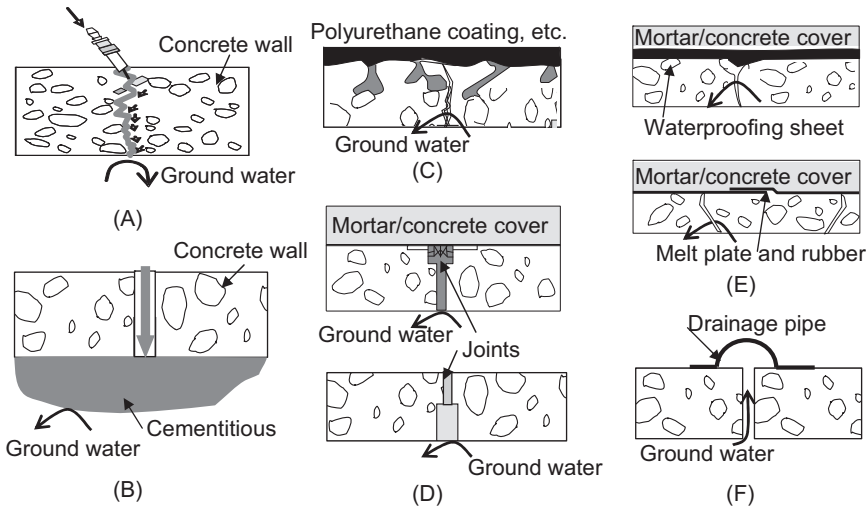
Tunnel waterproofing methods. (A) Crack seals, (B) ground grouting, (C) surface coatings, (D) joints seals, (E) membranes, and (F) rerouting.
